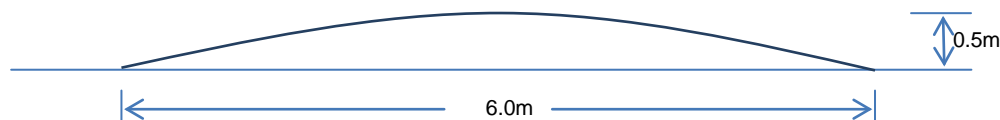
Example of section of crossover at corner of Second Street and Esplanade.
